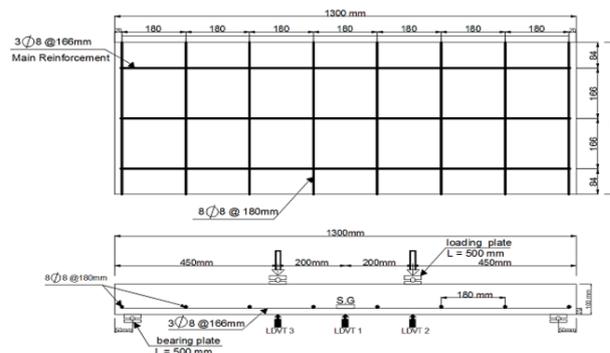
The test specimens' complete concrete dimensions and reinforcing information.
